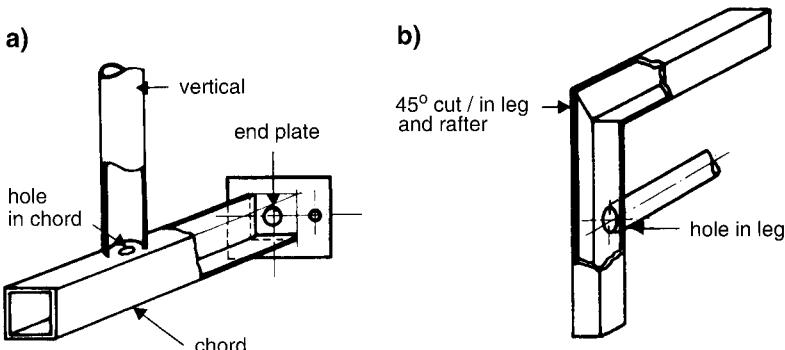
Arrangements of holes in hollow section connections a) T type joint b) Knee joint for hot dip galvanisation
